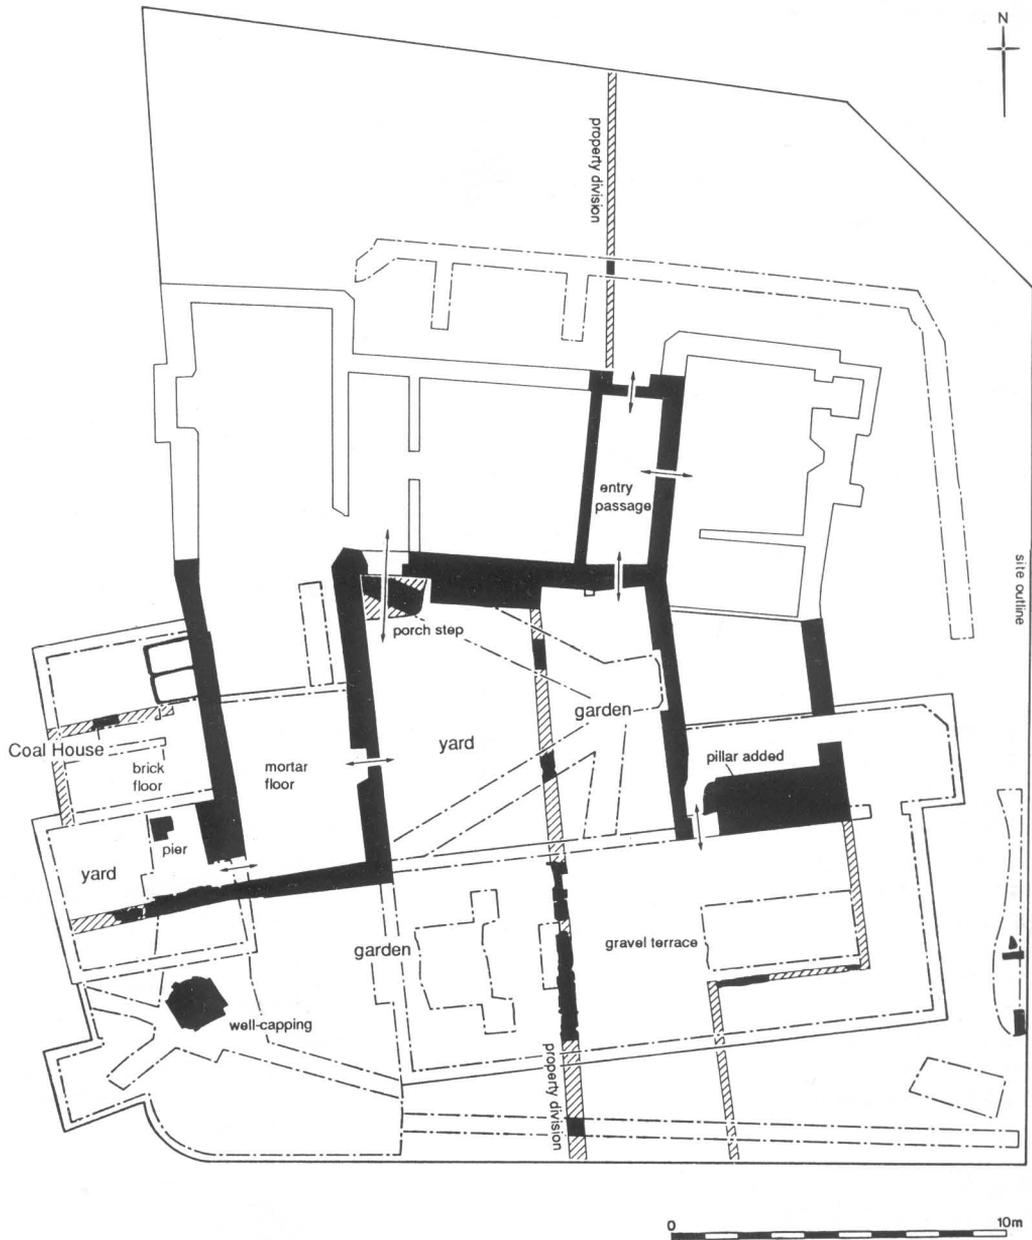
West Wing rebuilt and House divided, c 1740-1760
